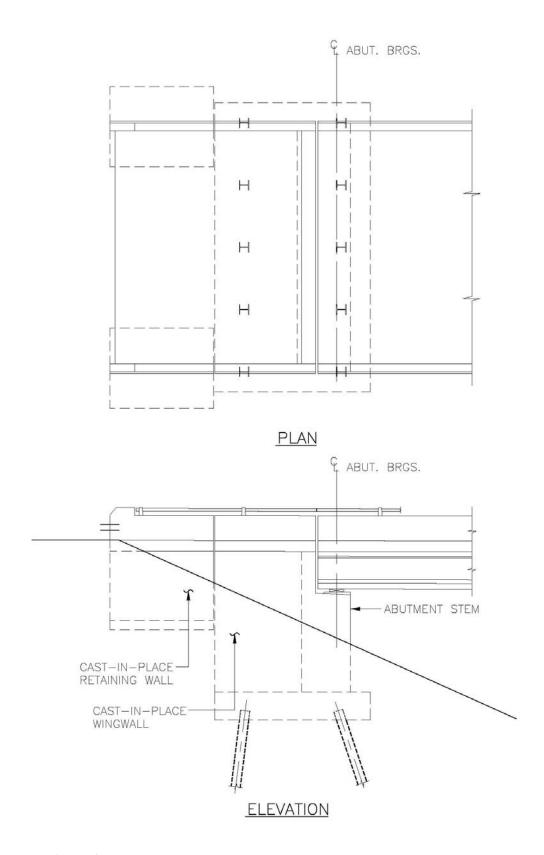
Conventional Abutment with Cast-in-Place Retaining Walls.
